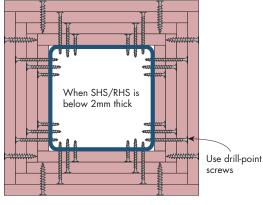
4 Sided Protection for SHS/RHS Elevation or plan view
